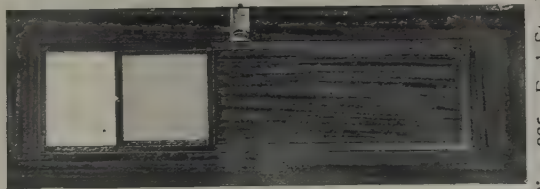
End Steel Door, Drop Sash and Half Panel Construction.
